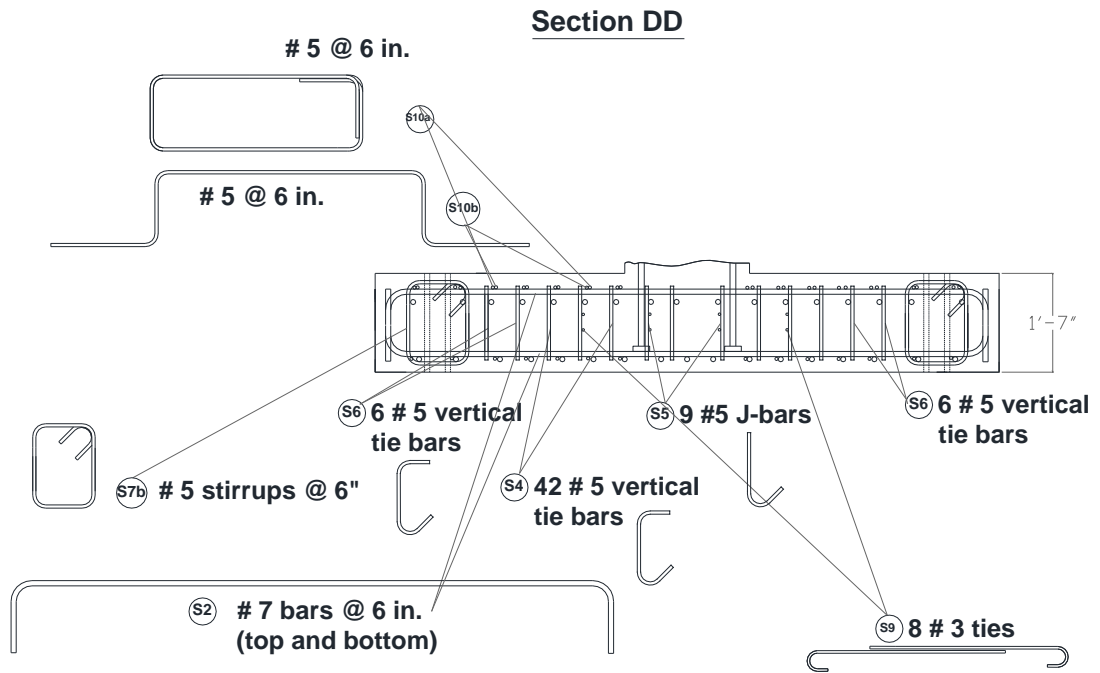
Elevation view of slab reinforcement at Section DD for Specimen #3
